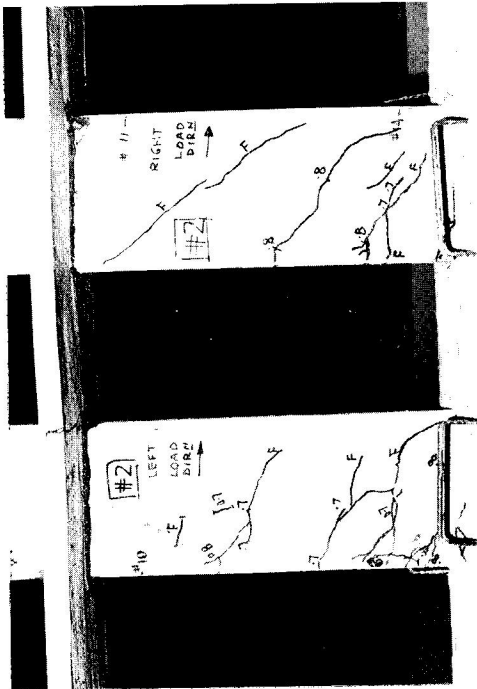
CRACK PATTERN & FAILURE MECHANISM
